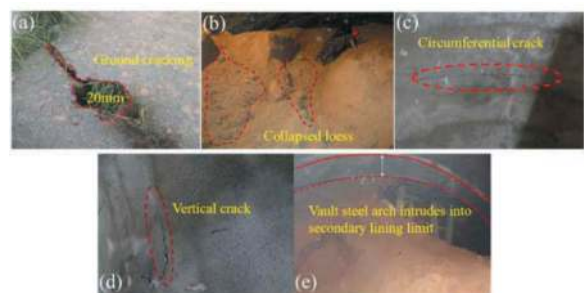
Deformation characteristics of tunnel surrounding rock (a: ground cracking, b: partial collapse, c: circumferential crack, d: vertical crack, e: vault subsidence).
